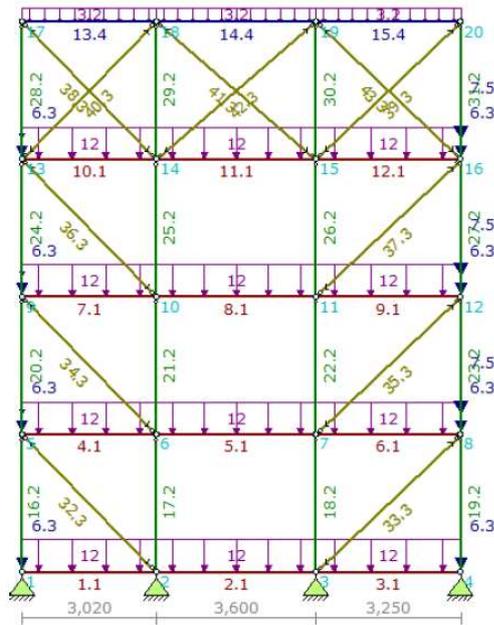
Longitudinal stability scheme (Pieters Bouwtechniek).
